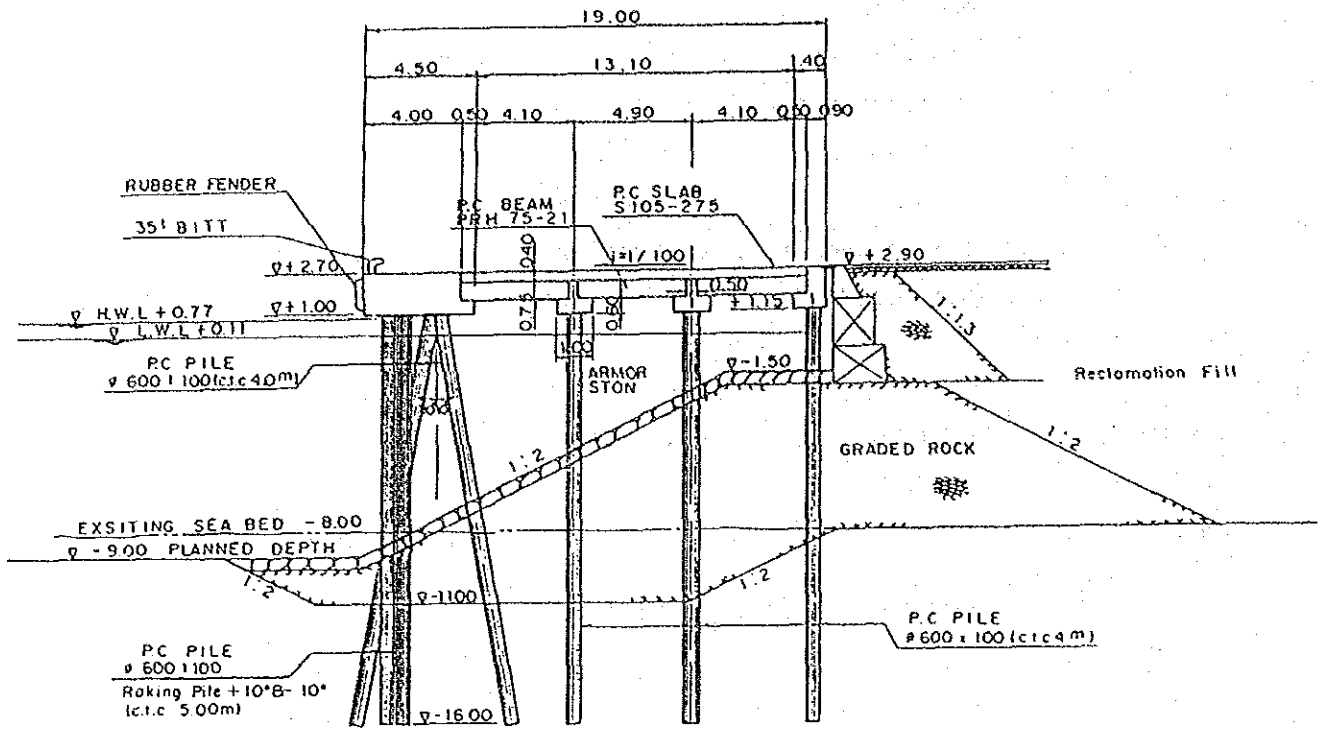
Typical Cross Section of JCT -9.0 m Quaywall
